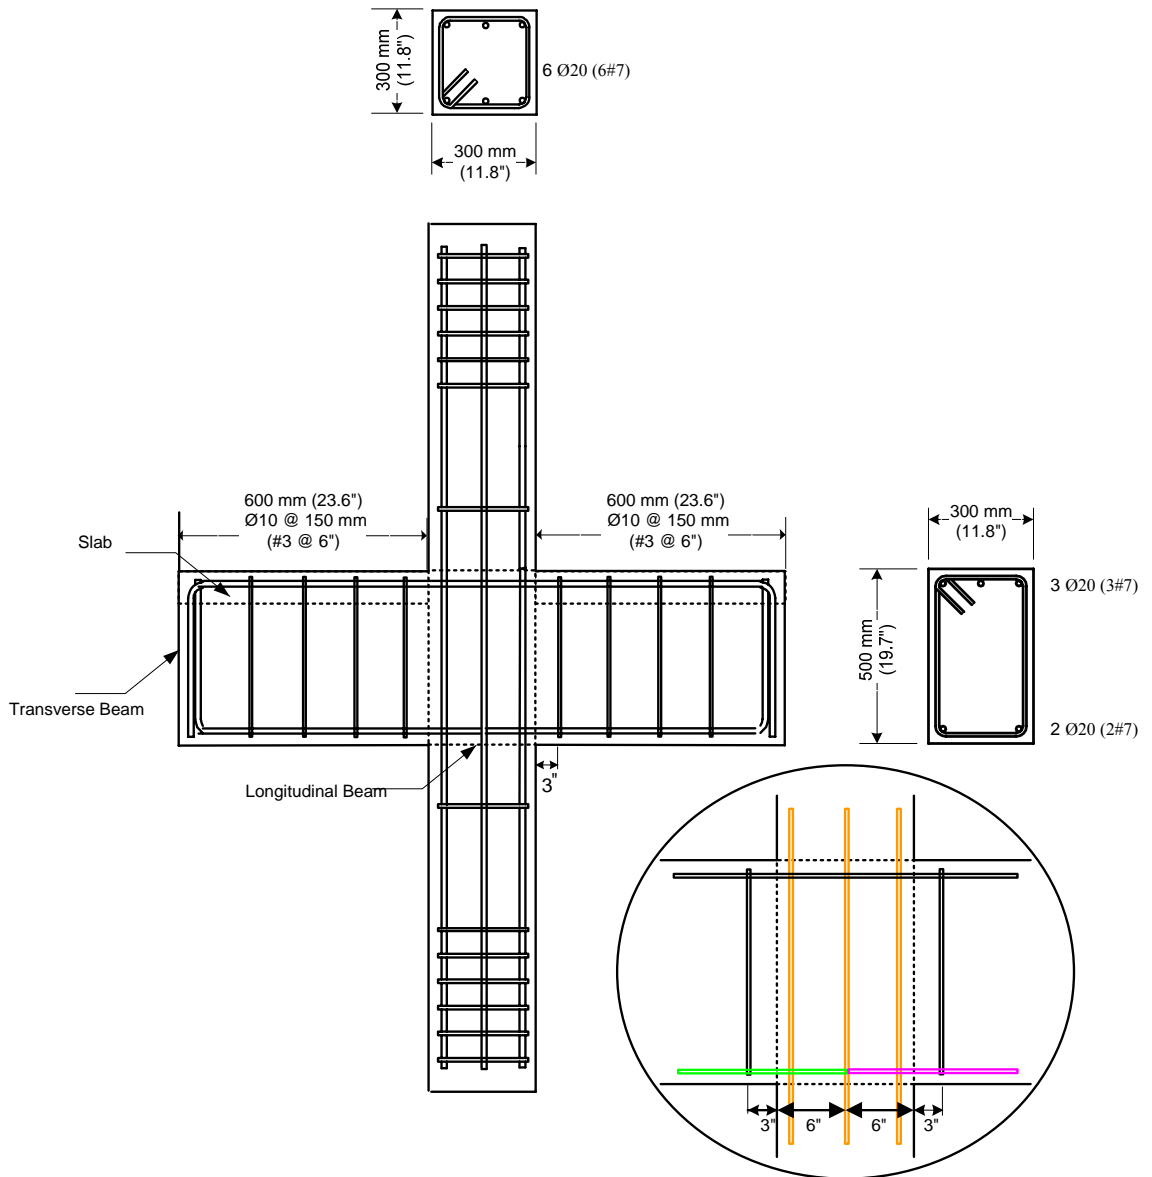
Reinforcement details of US3-ES specimens (Side view)
